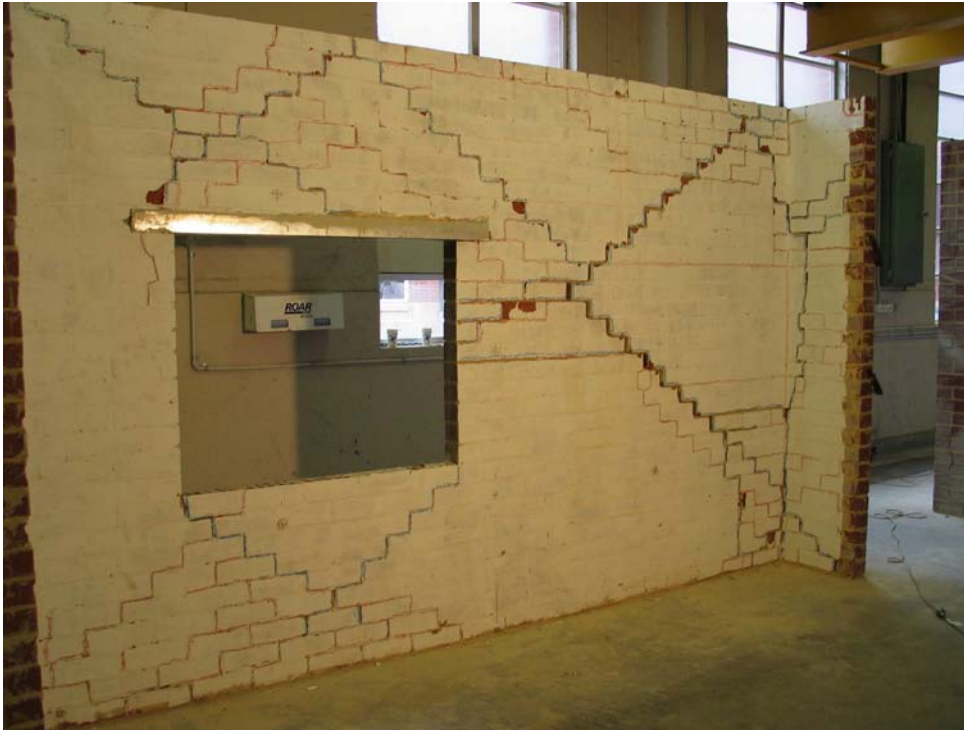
Photograph of wall s3 crack pattern at the conclusion of cyclic testing.
